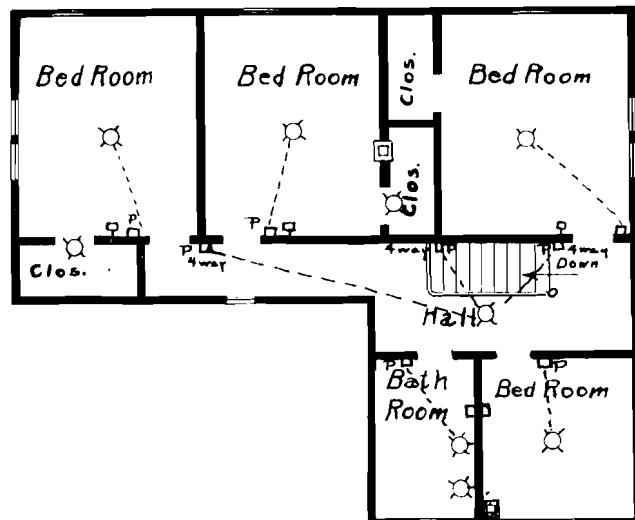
Original wiring, second floor. Three-point control on hall lights, and wall switches to control lights in bathroom.
